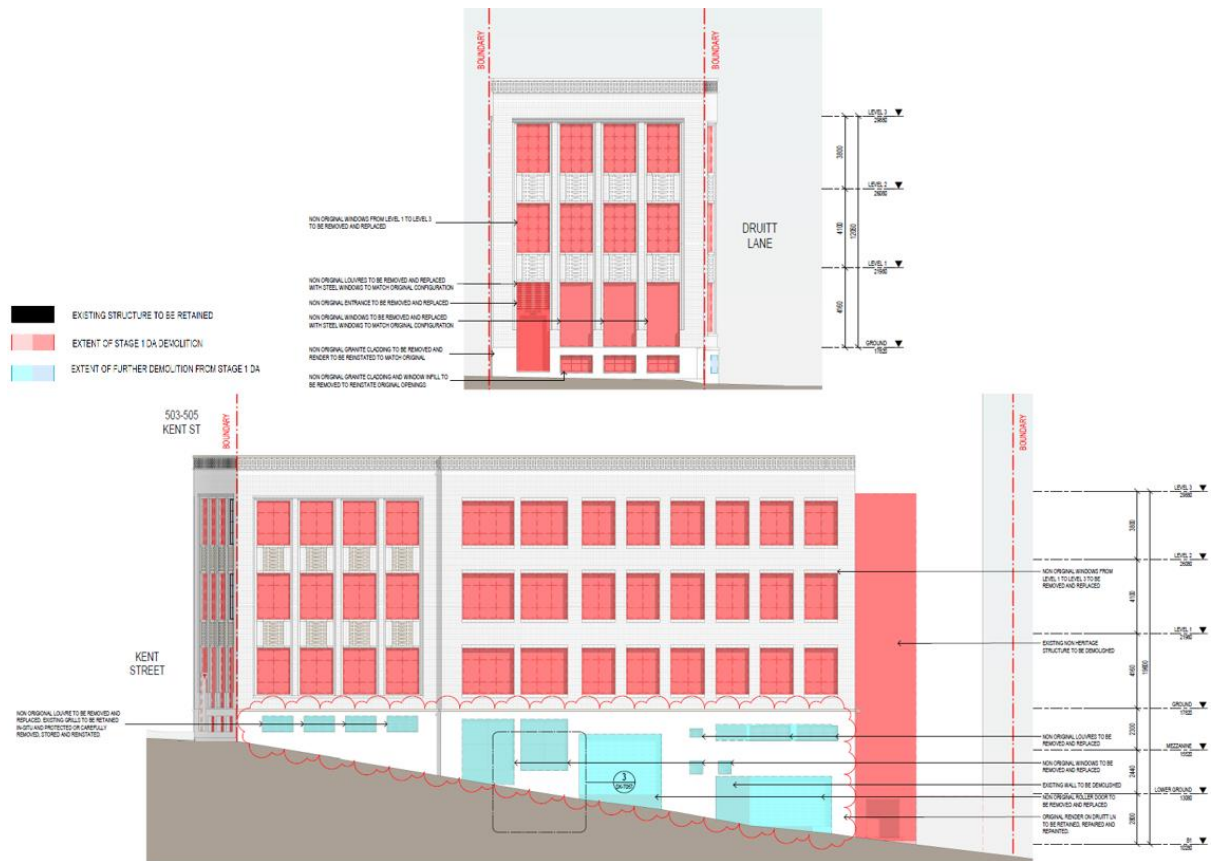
Proposed indicative demolition - heritage elevations (removal of non-original fabric)
